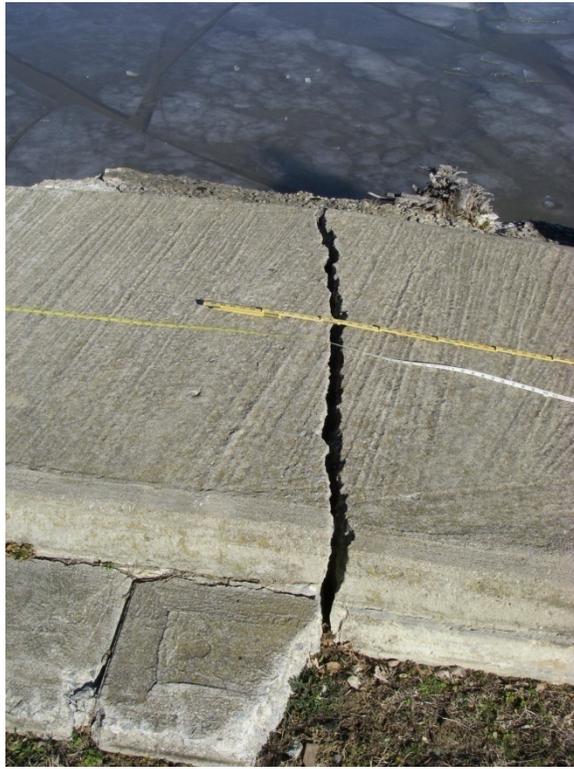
1¼" Wide Full Width Crack in Slab 9
